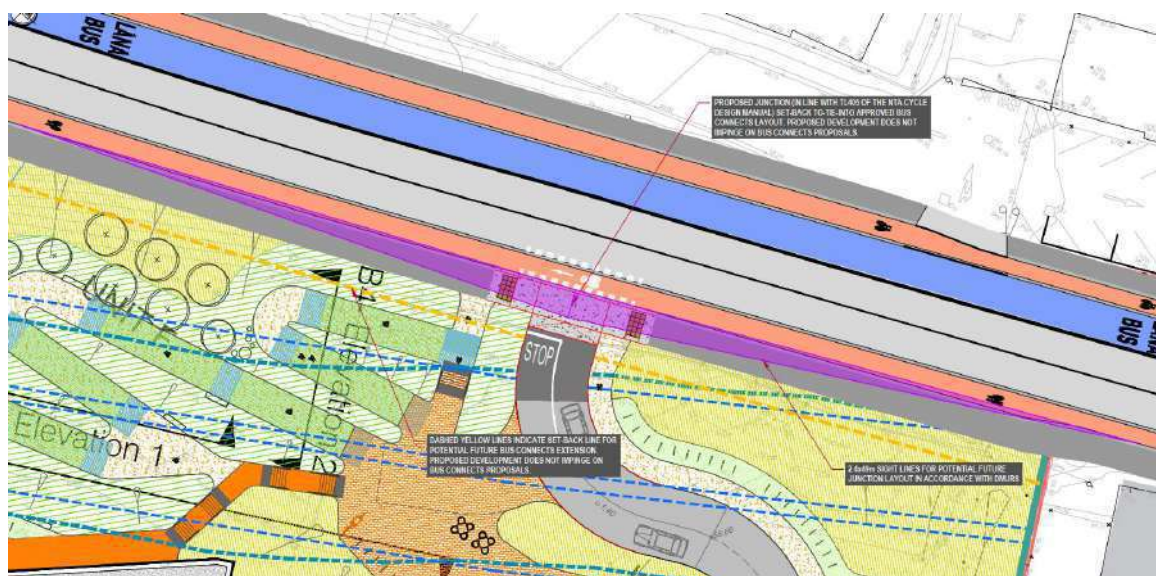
Proposed Future Greenhills Road Site Access Junction (NRB-TA-008)
